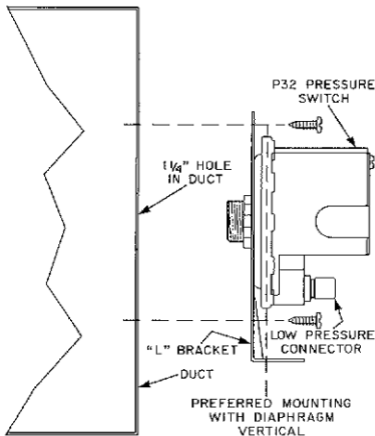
Direct mounting a P32 using the “L” bracket as a mounting flange.
